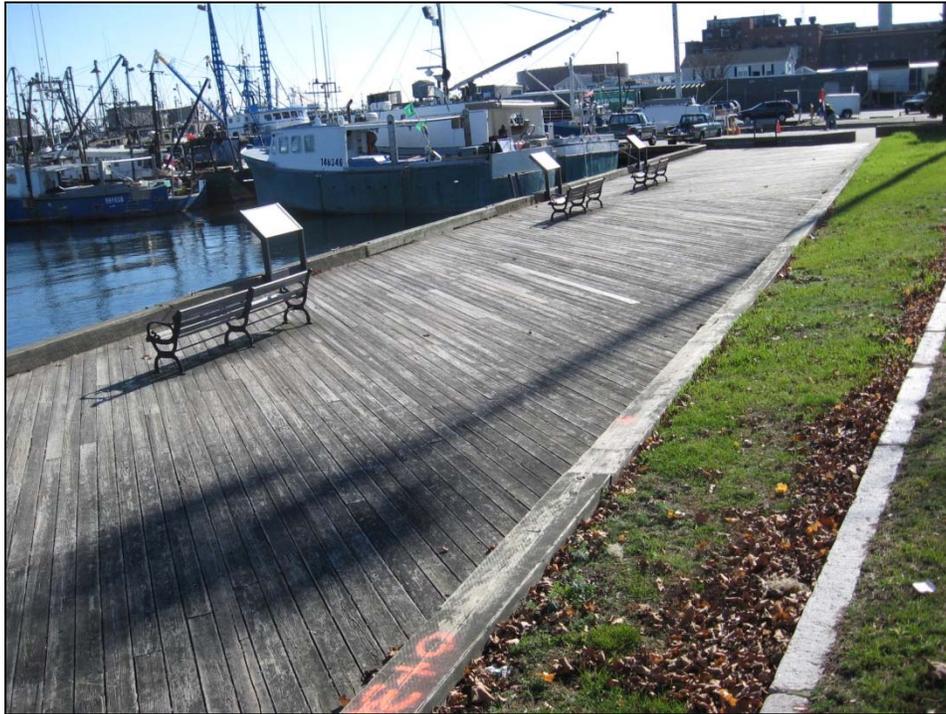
Overview of the timber wharf adjacent to Steamship Pier.
